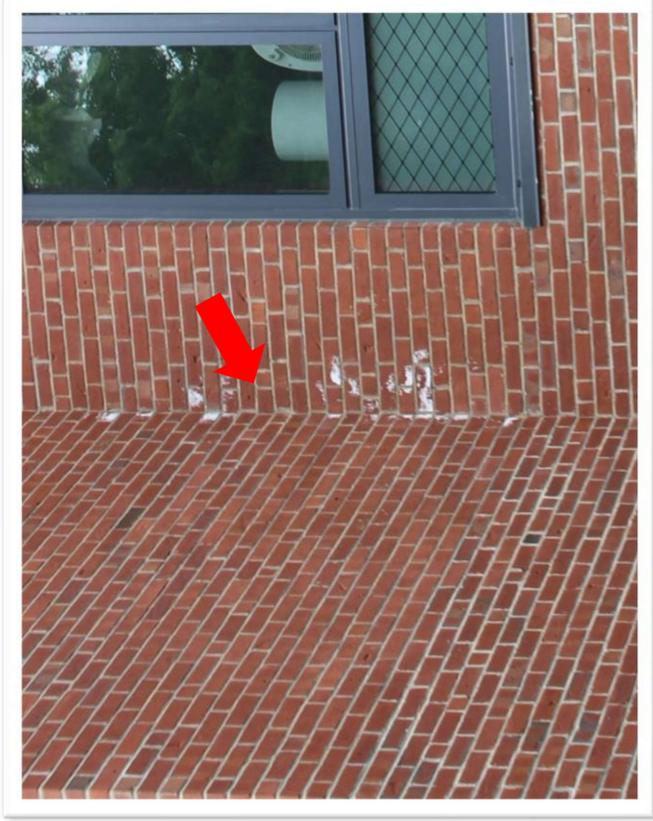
Presents of efflorescence on surface of brick at possible leak location.
